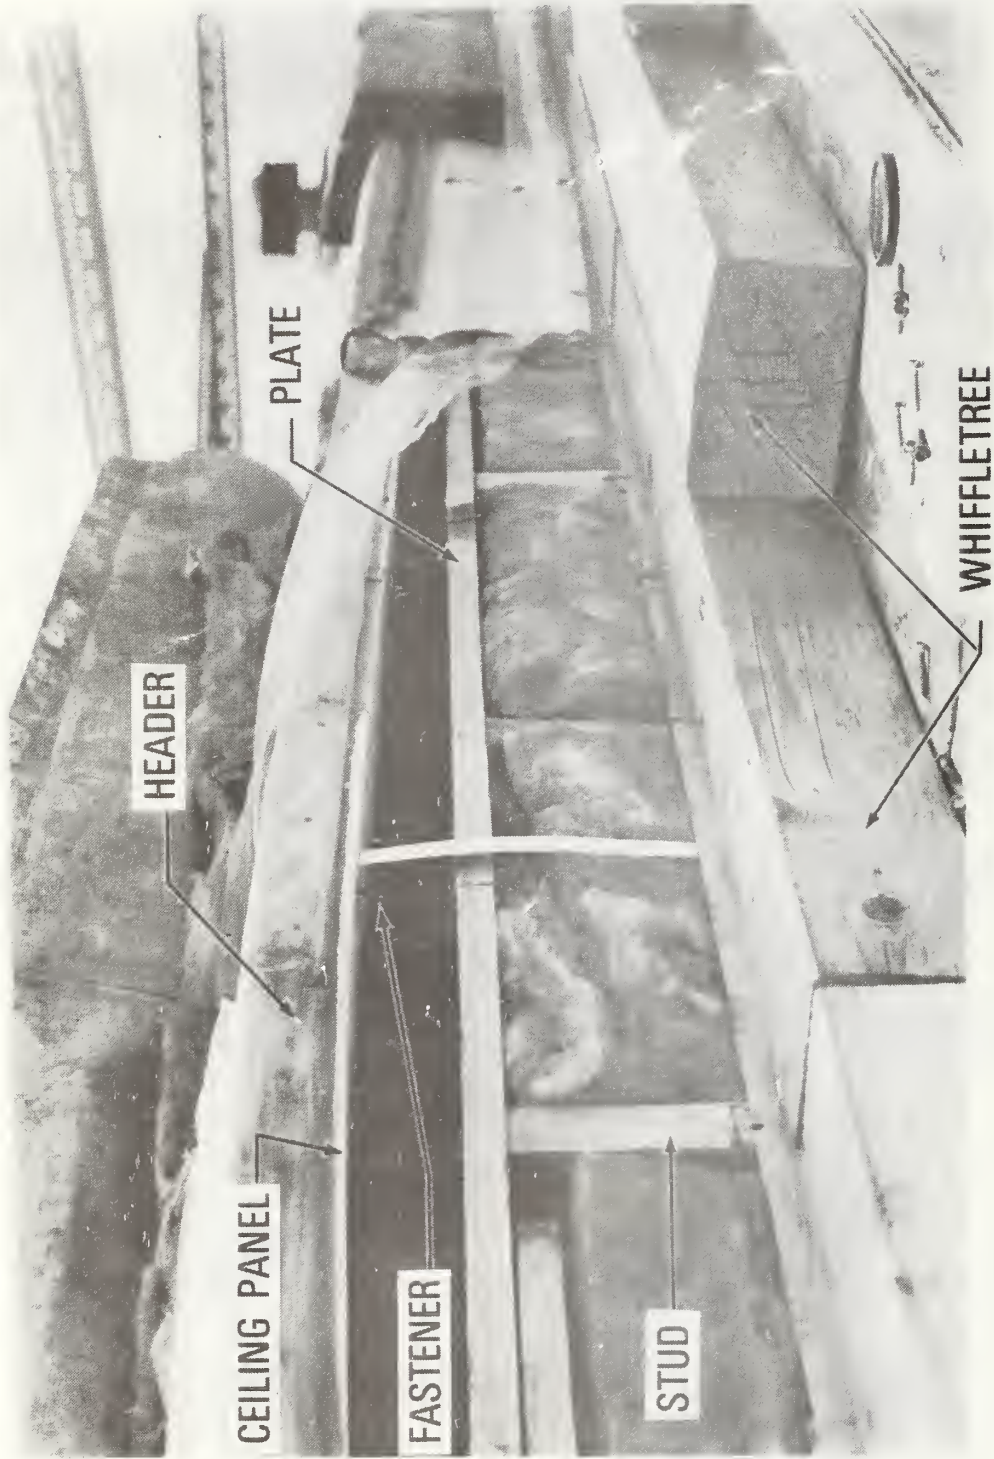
View of Top Plate and Header (facia strip and roof membrane removed)
